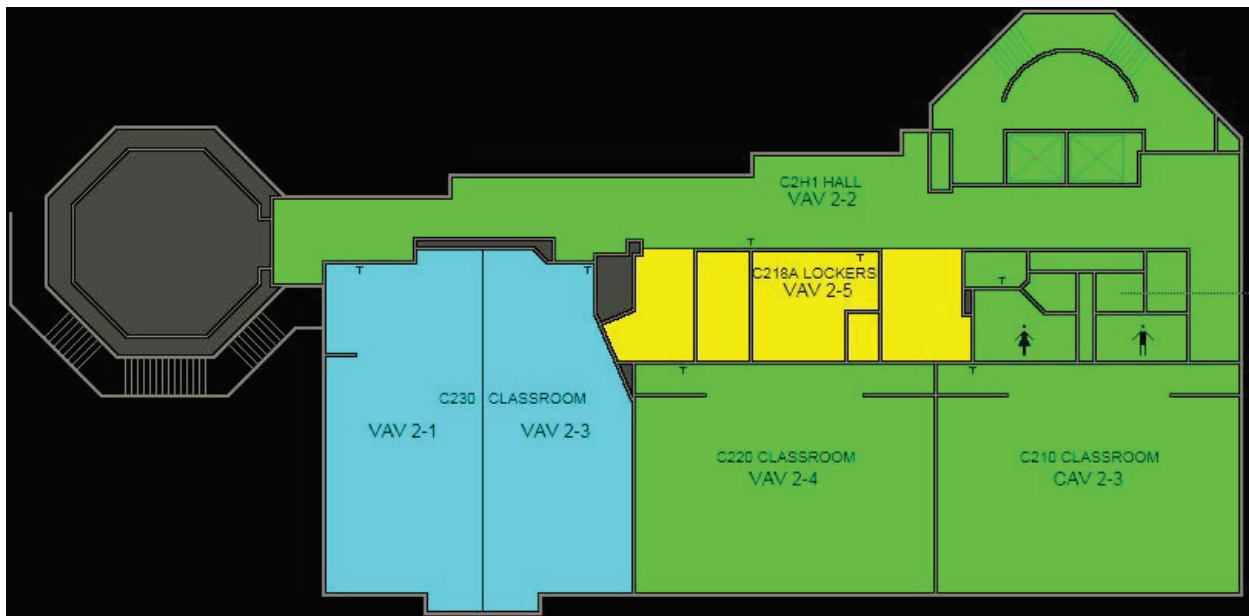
Floor plan of the studied room (Room C220, UC Berkeley Cheit Hall)
